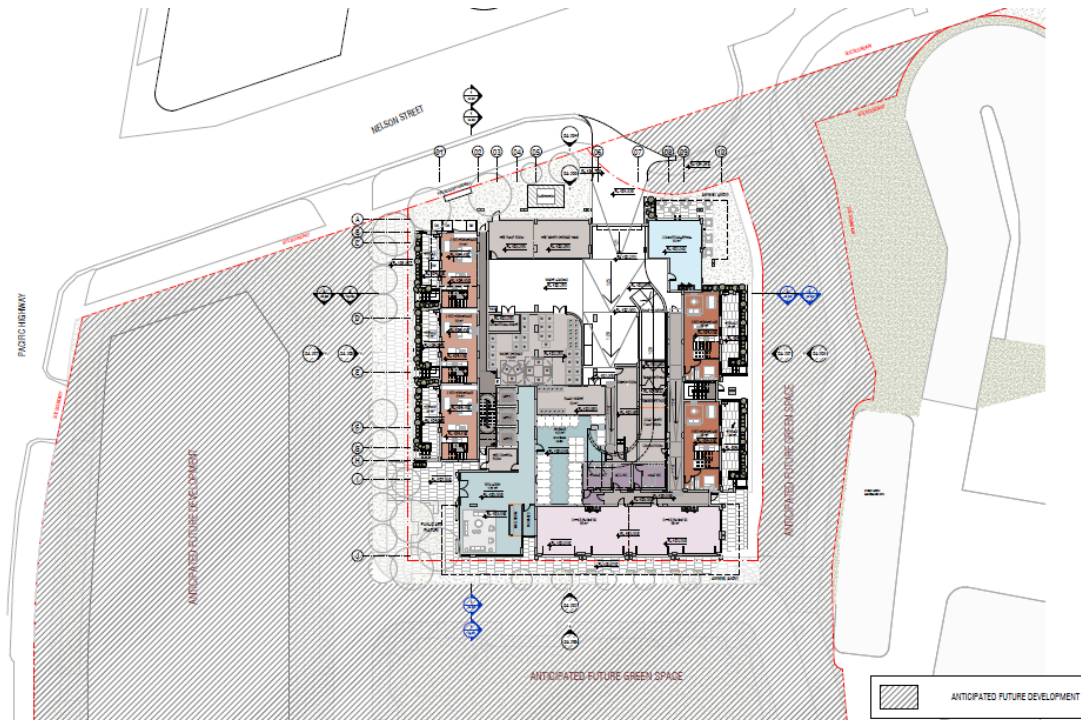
Proposed Site Layout- Ground floor Plan (Source: FK Australia dated 3 December 2025)
